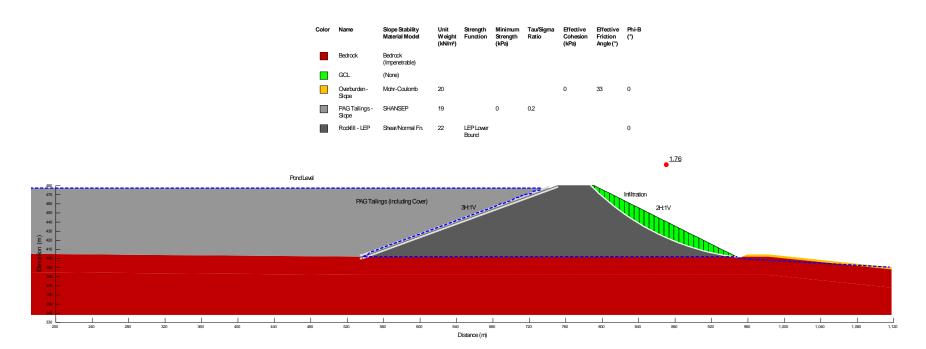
CDF South Cell Perimeter Dam, Typical Section – Stability Analysis of Long-term Loading Condition
